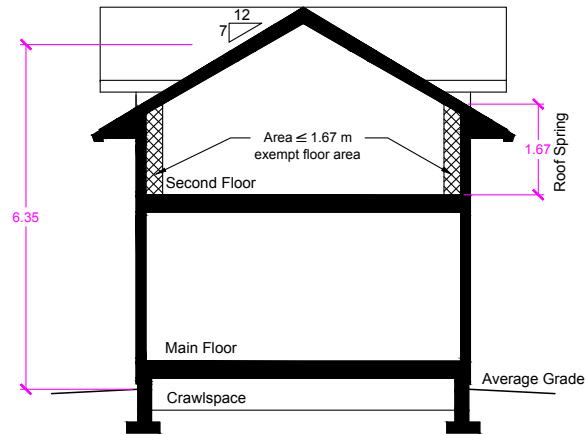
A roof should spring between the upper floor level and 1.67 m above it
